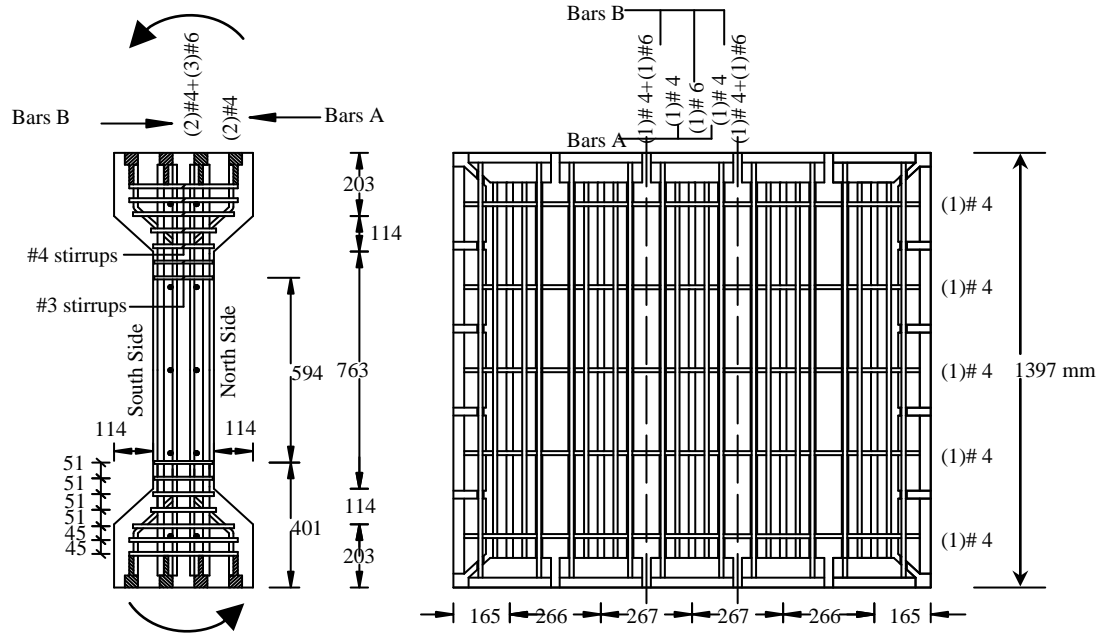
Reinforcement layout of panel OPR (25.4 mm = 1")
